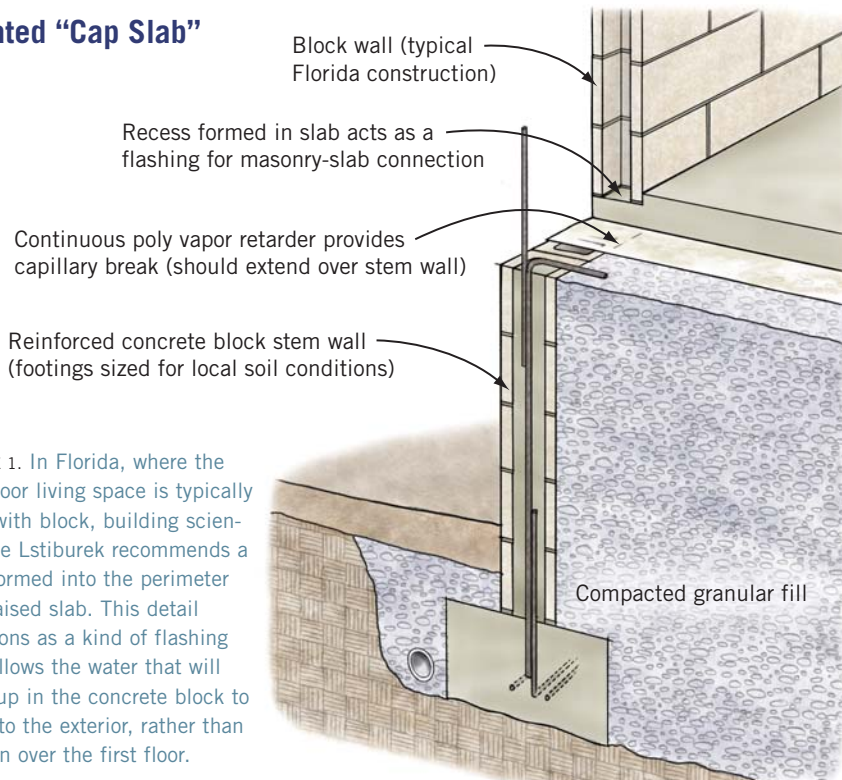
In Florida, where the first-floor living space is typically built with block, building scientist Joe Lstiburek recommends a seat formed into the perimeter of a raised slab. This detail functions as a kind of flashing that allows the water that will store up in the concrete block to drain to the exterior, rather than seep in over the first floor.
